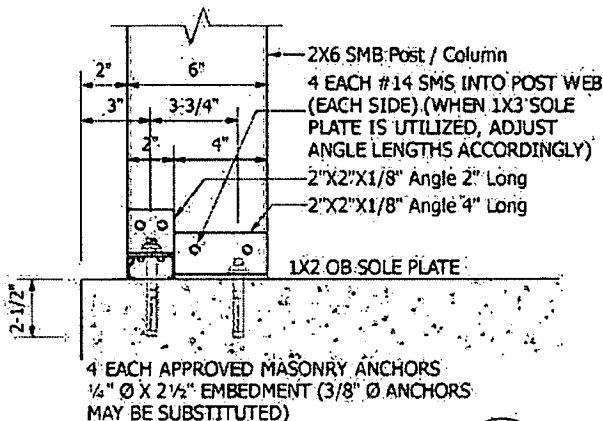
Elevations show the foundation connections, for various depth columns (posts/uprights). Columns (posts/uprights) must not exceed allowable spans in Table 102.
